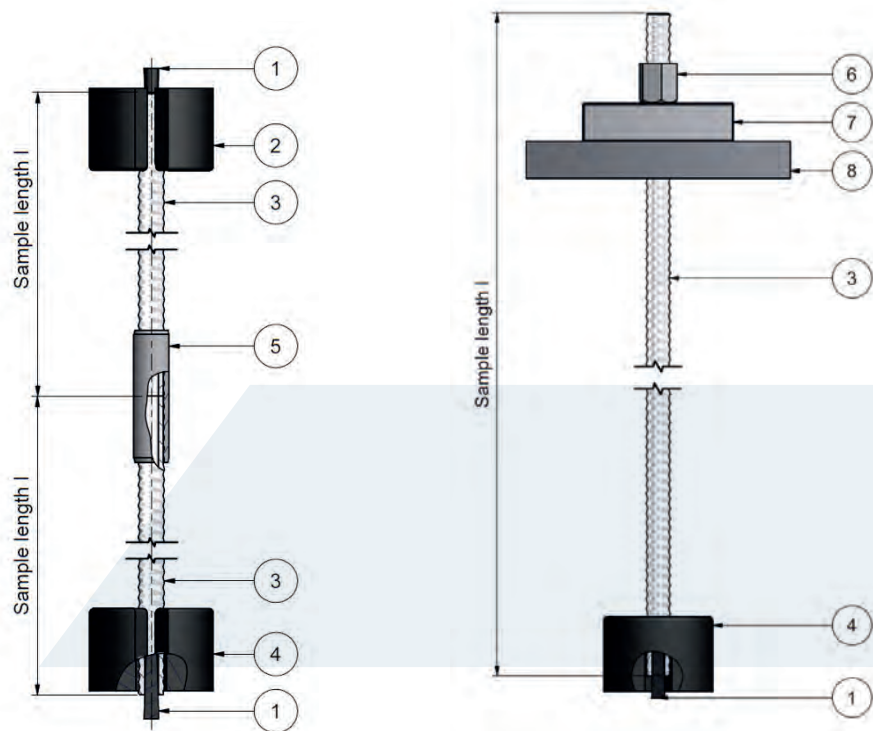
Exemplary functional test assembly for bolt heads and couplings. (1 plugs, 2 clamping top, 3 tendon, 4 clamping bottom, 5 coupling, 6 nut, 7 plate, 8 bearing plate).
